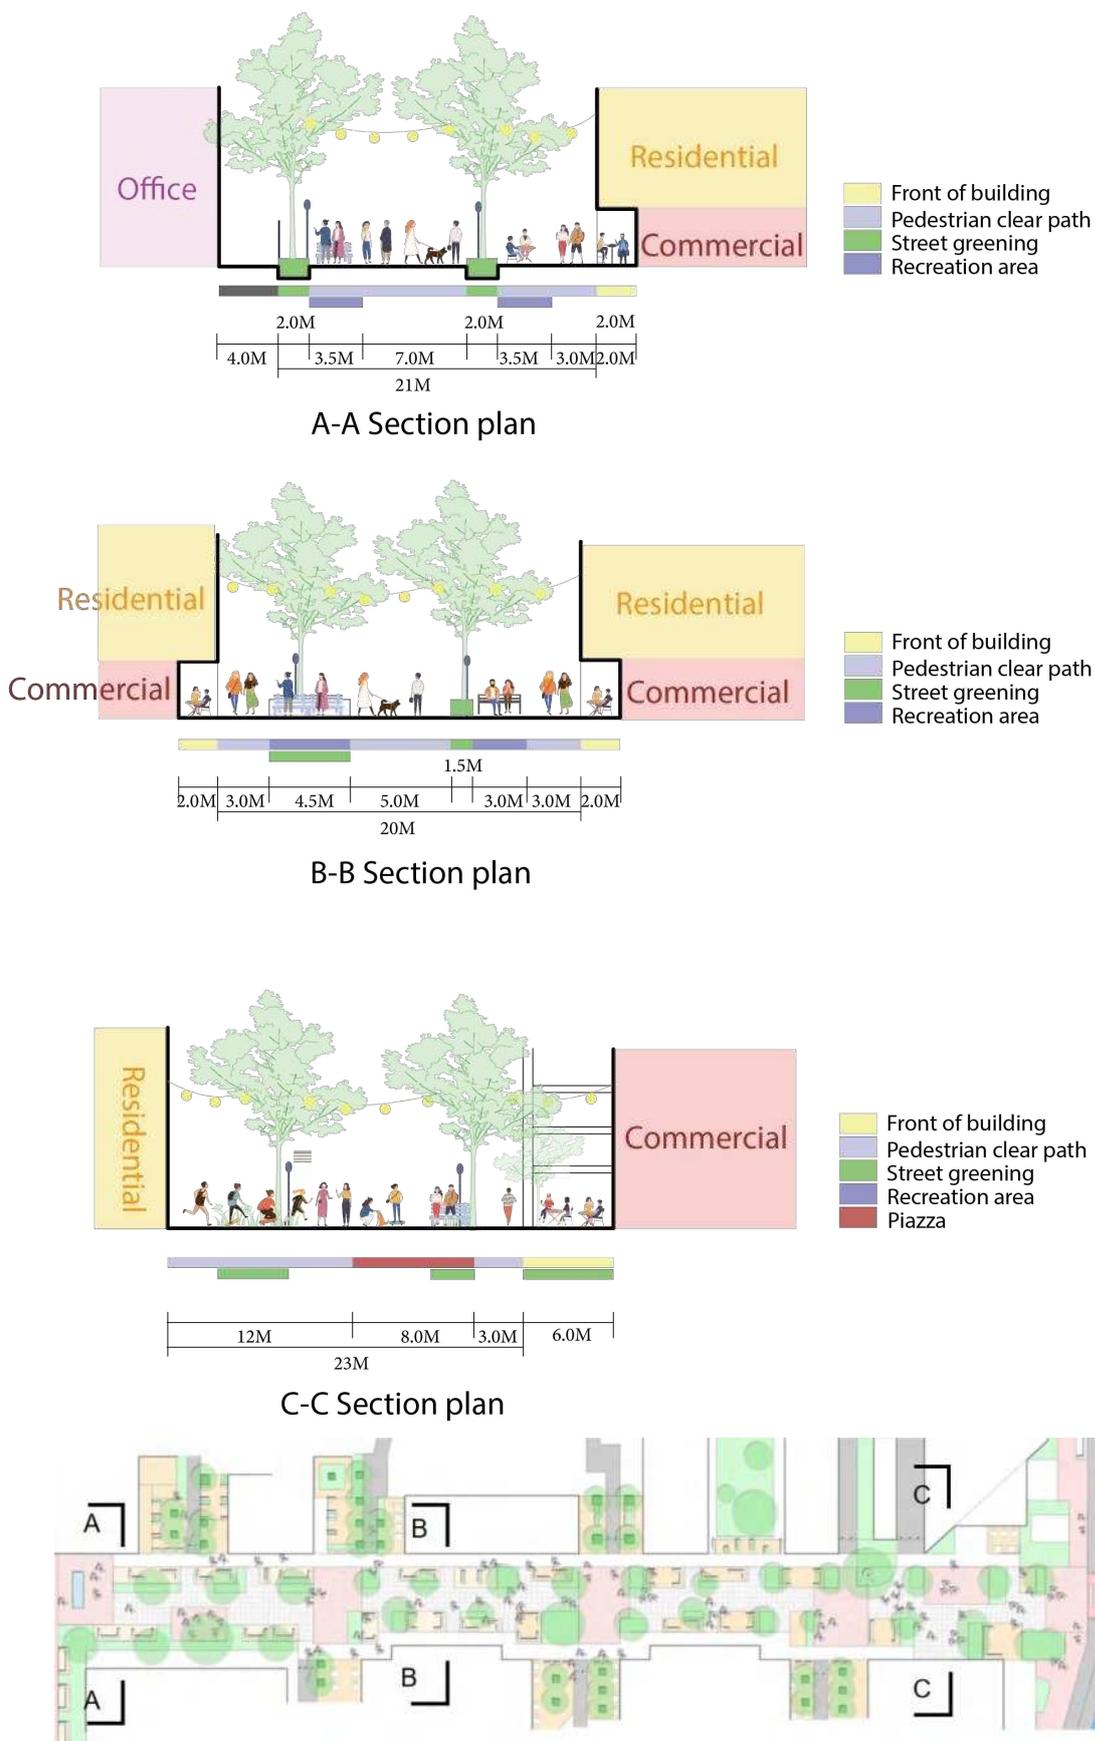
Street profile of the renovated pedestrian street south of the Tianhe Nan Pedestrian Street(northern section).(Completed by author)
